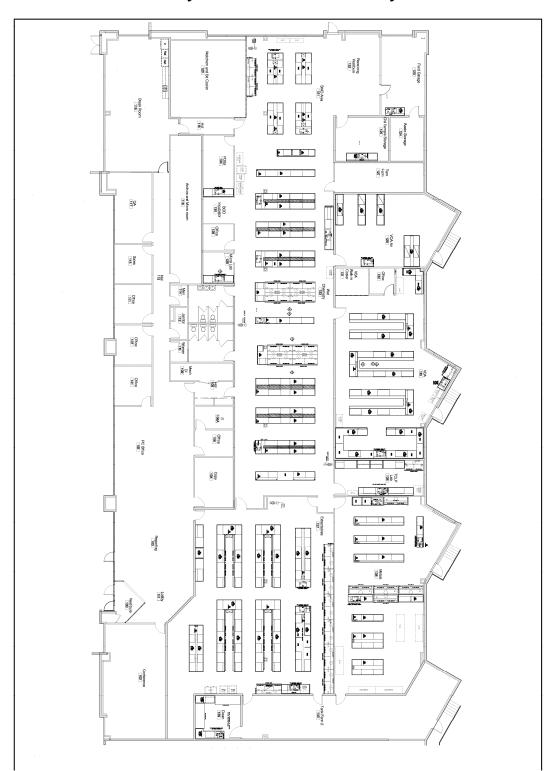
Columbia Analytical/Rochester Laboratory Floor Plan
